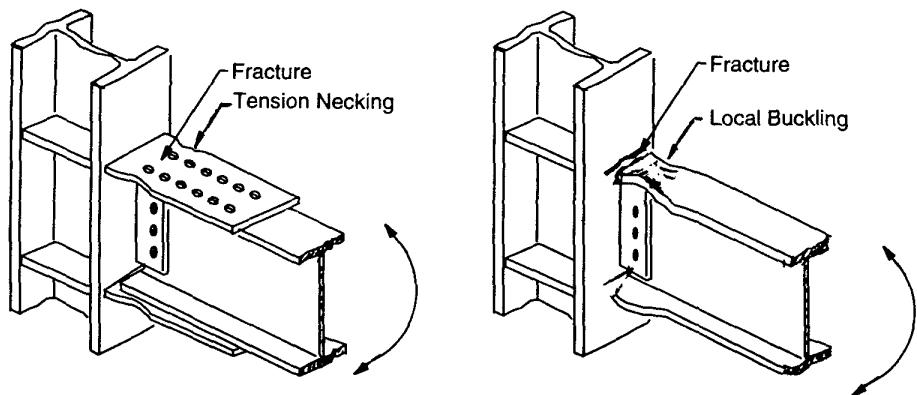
Typical Failure Modes of Welded and Bolted Moment Connections
